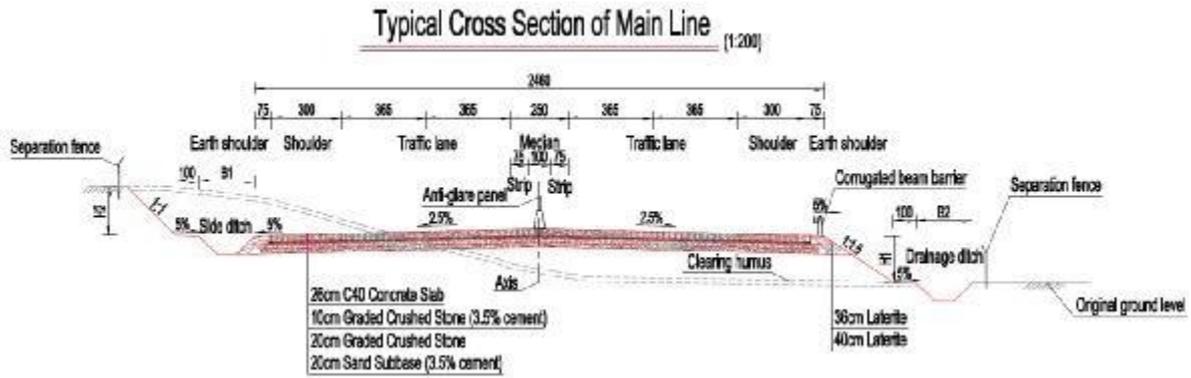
Standard Mainline Subgrade Cross-Section (24.6m width)
